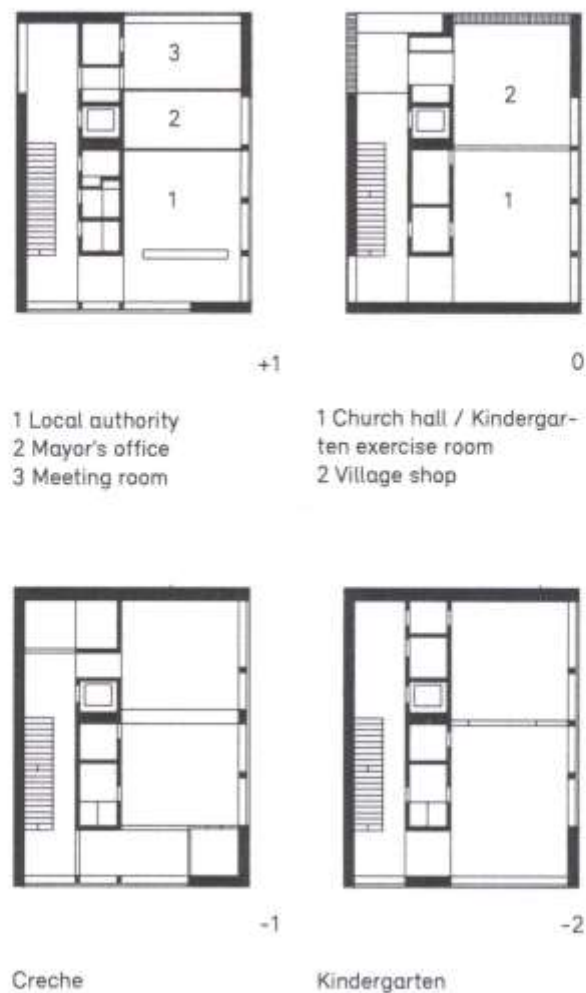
floorplan (source: Cukrowicz Nachbaur Architekten ZT GmbH 2008)
